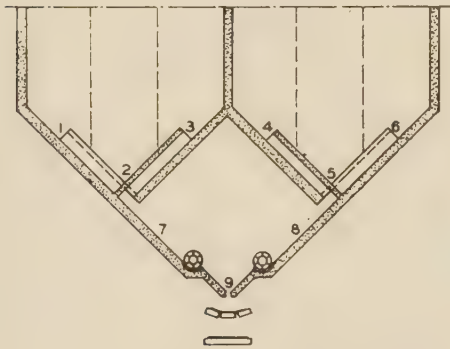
BIN CONSTRUCTION, ELEVATION SECTION
